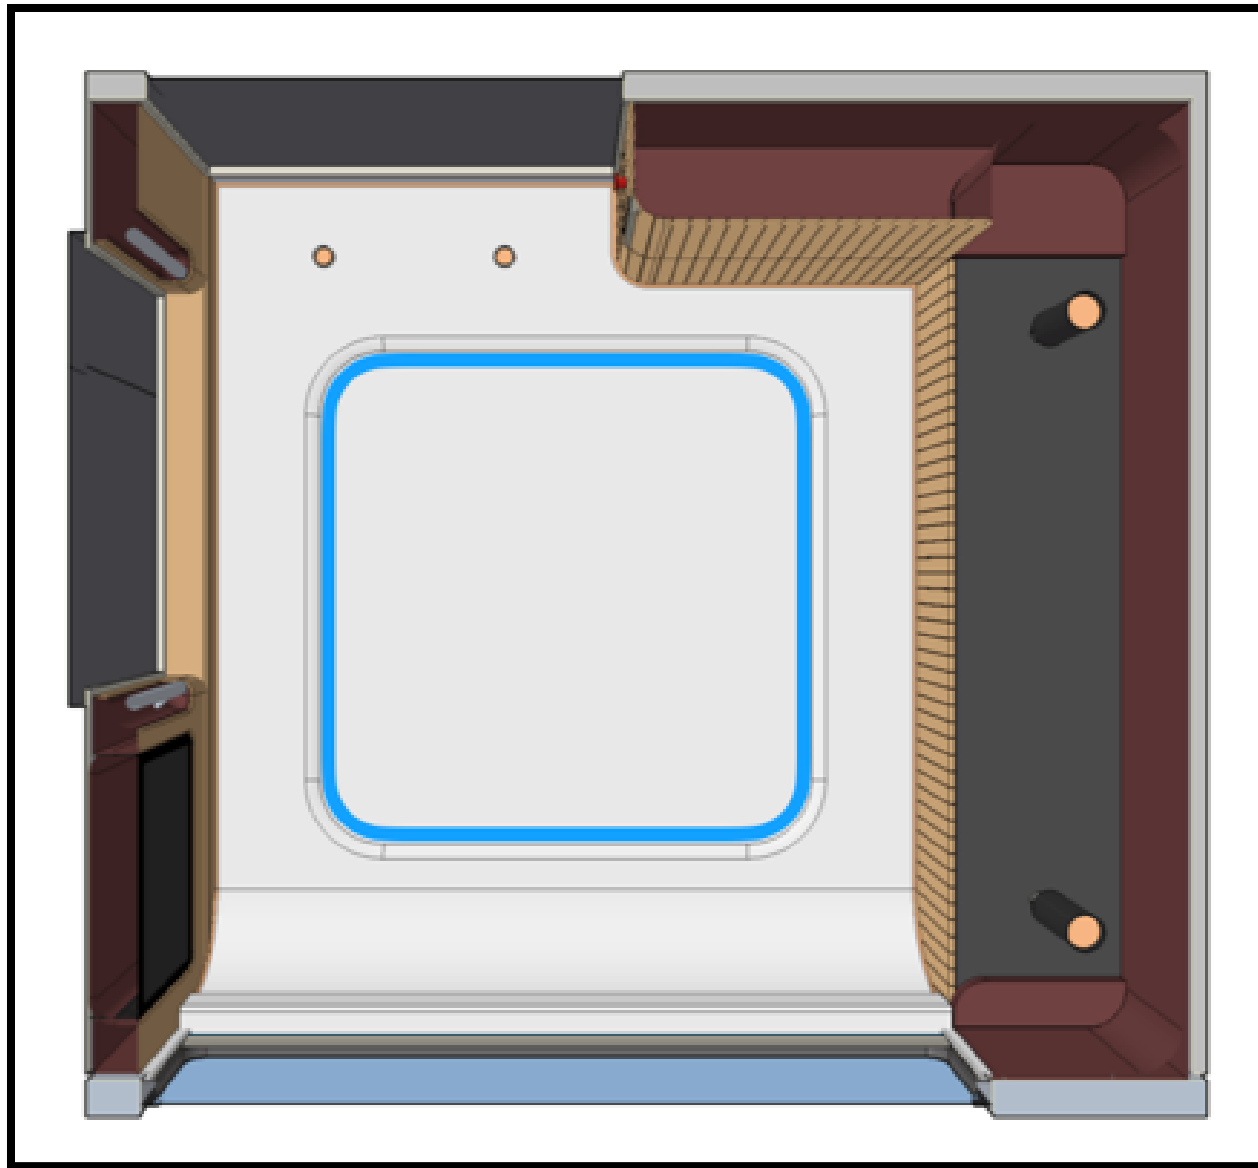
Accessible Double Ceiling Pool Light Locations
